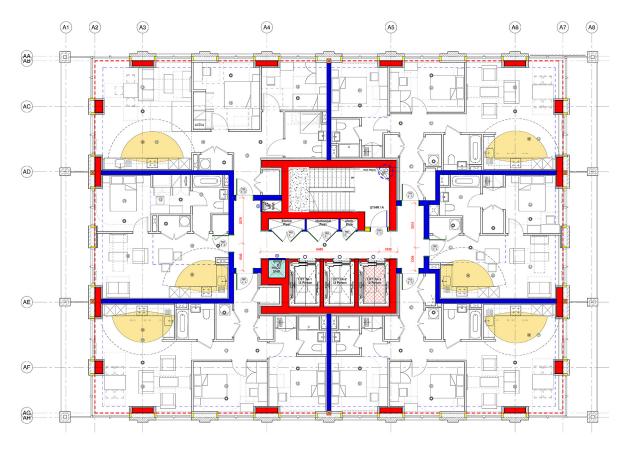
Typical fire strategy plan with coloured compartment walls illustrating the fire ratings required (image courtesy of Broadway Malyan)
